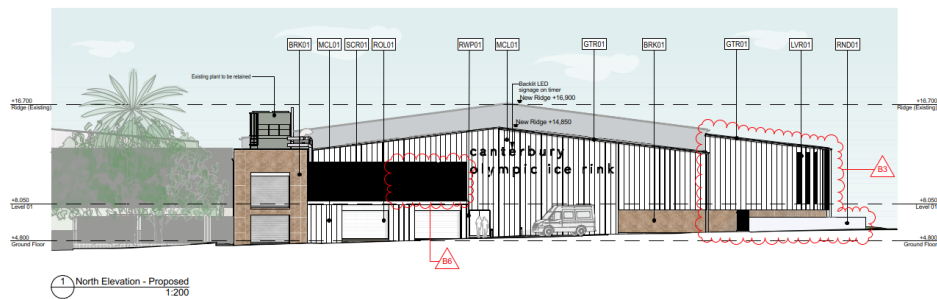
Proposed Northern Elevation (Source: Kennedy Associates Architects 2024 2221-DA202 Rev C)
